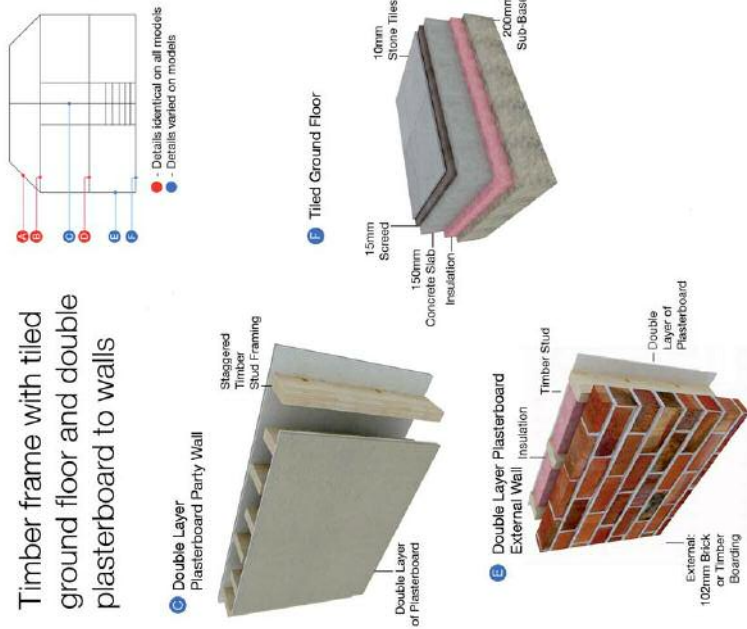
Timber frame with tiled ground floor and double plasterboard to walls
